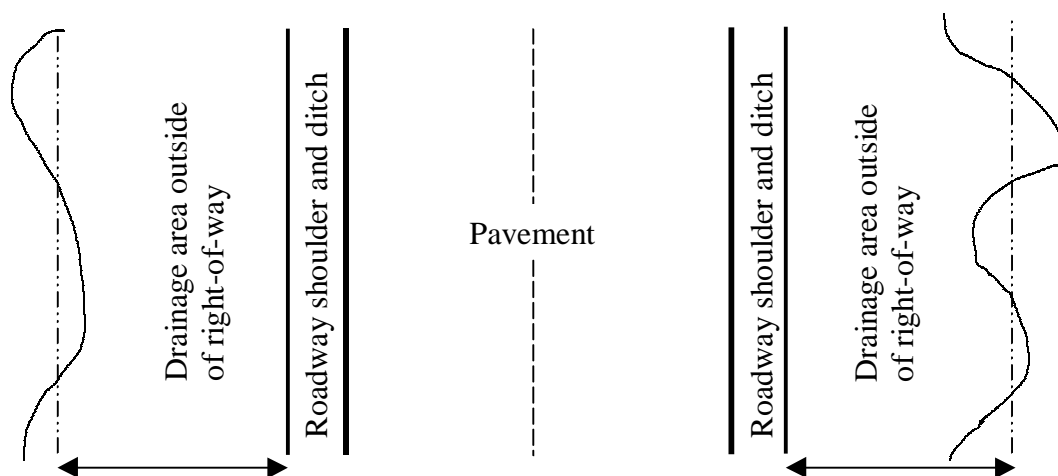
Typical drainage area components of a roadway ditch; area outside of right-of-way approximated by width-of-strip method.
